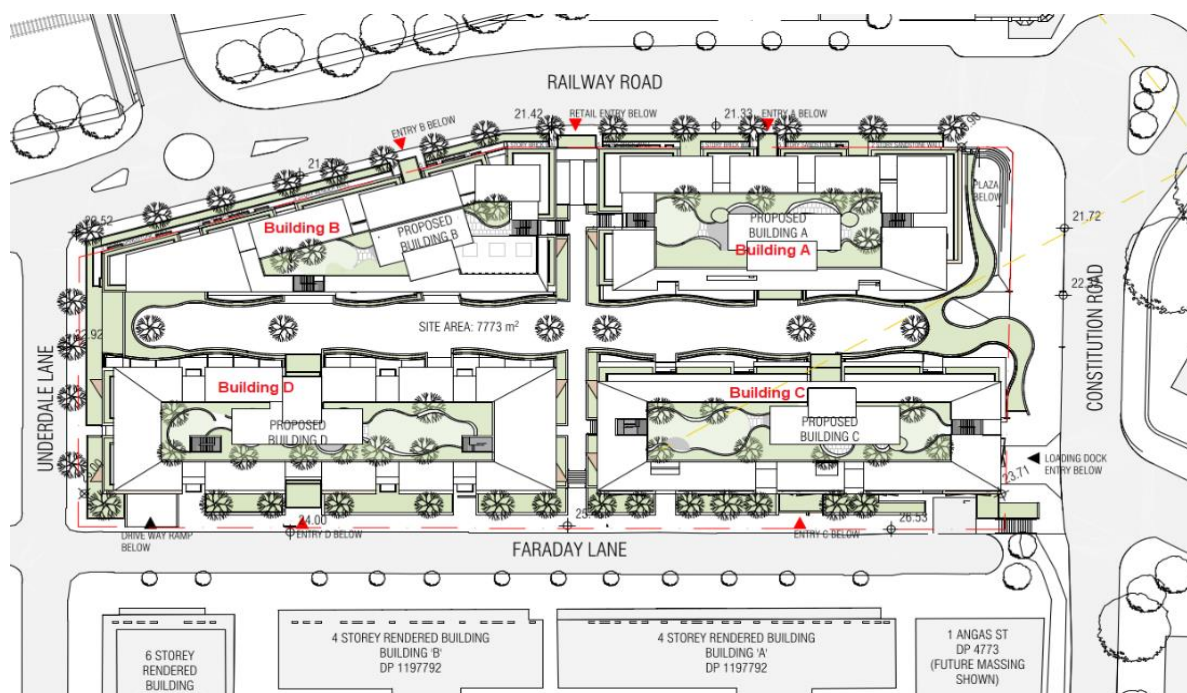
Plan showing the development, showing the roof level and location of each of the buildings.
